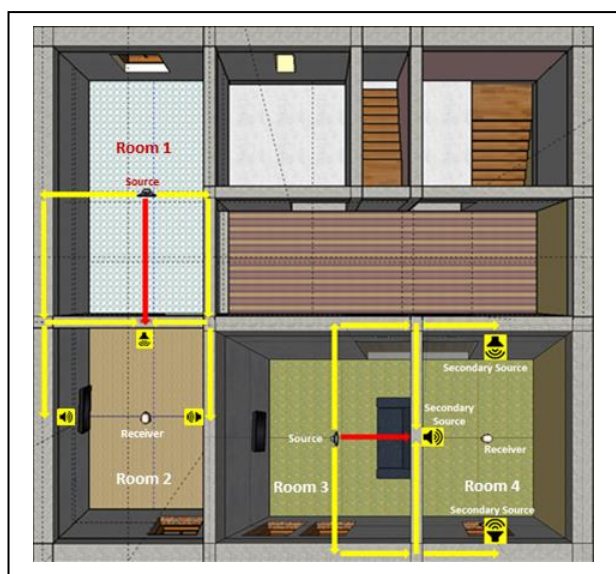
SketchUp model of an example building consists of two pairs of coupled rooms.
